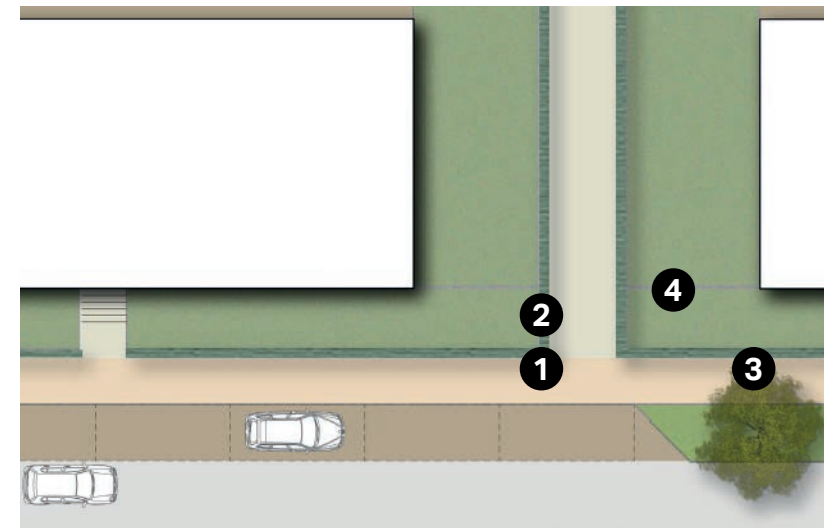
Illustrative diagram showing an indicative layout of on-street inset parking.
